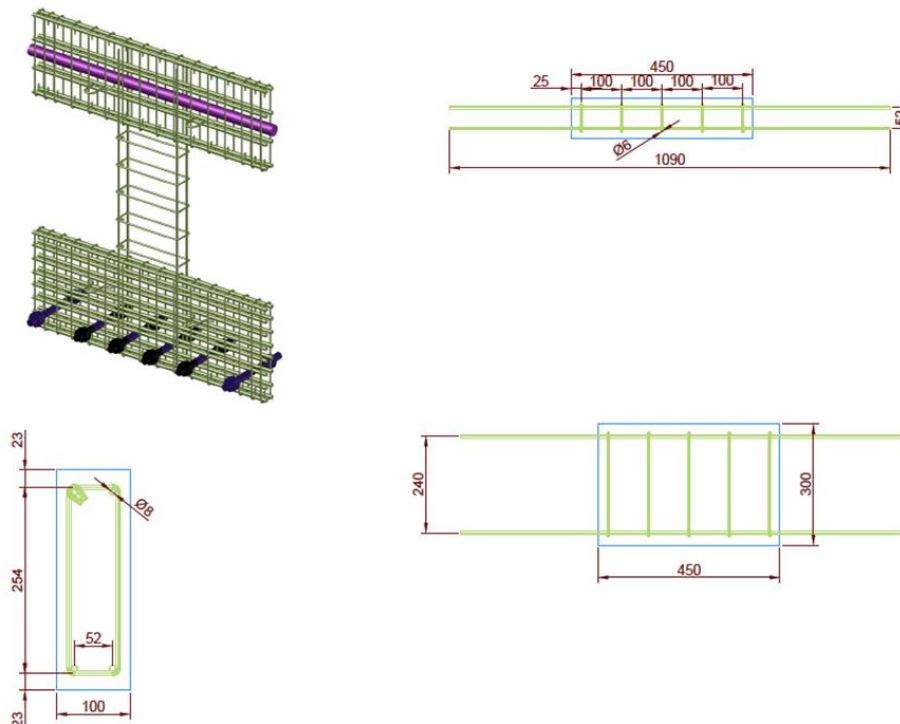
Reinforcement cage detailing – Coupling beam
